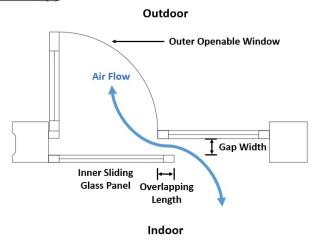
A Plan on Acoustic Window (Baffle Type)
